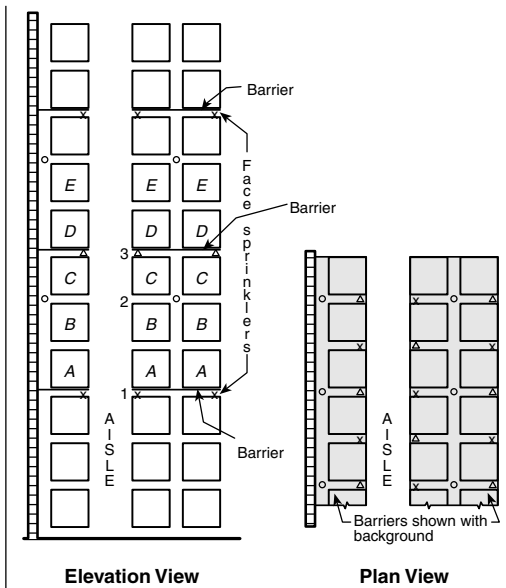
Positioning of In-Rack Sprinklers in
